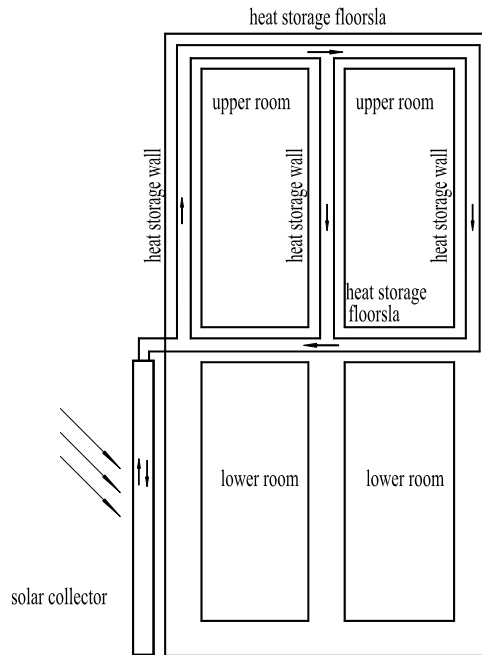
The heat storage walls (floorslabs) and solar collector installed in the lower layer
